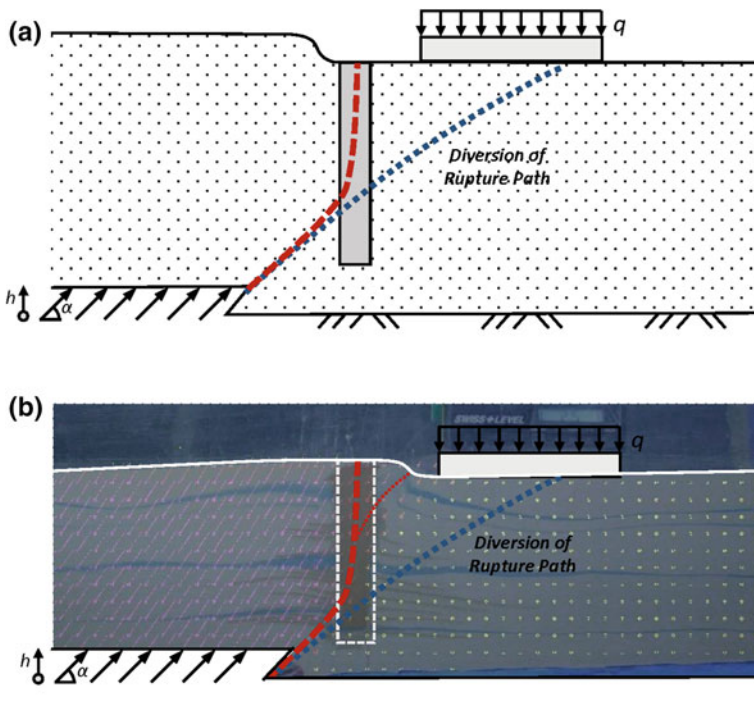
Mitigation through weak wall barrier for a foundation subjected to reverse faulting: a sketch of the main concept; and b experimental image of the response of such a wall using the Soil Bentonite Wall (SBW) concept (Fadaee et al. 2013)
